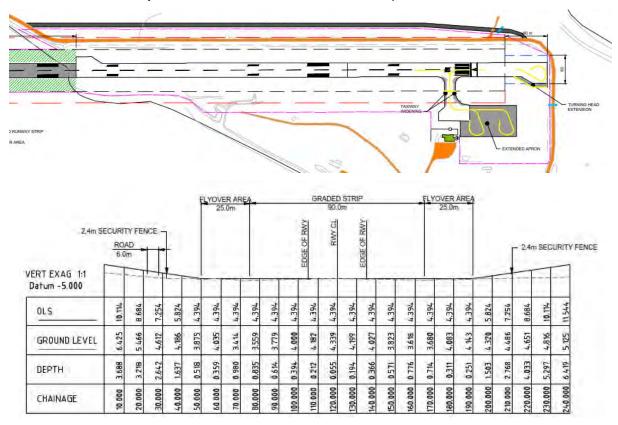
Realigned Island Road layout and OLS assessment of fence line
